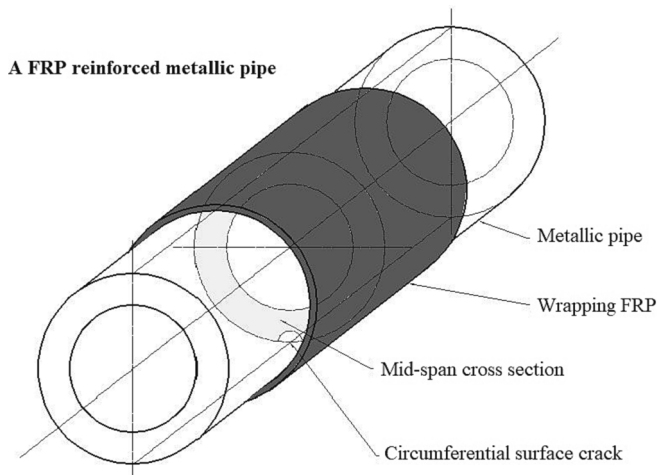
FRP reinforced circumferential external surface cracked pipes in a metallic pipe.
